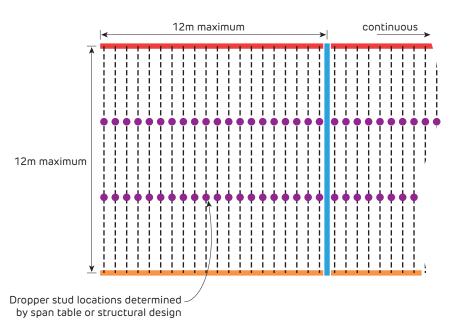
Stud Ceiling Type A2 - Fixed / Sliding
